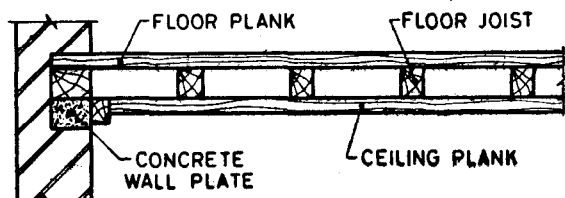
CLOSED CEILING WITH PLANKS FIXED DIRECT BELOW FLOOR JOISTS
